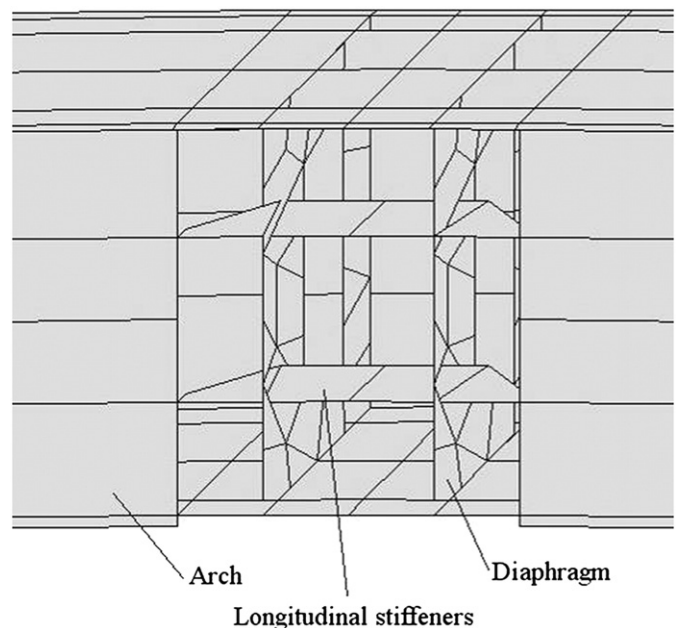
Detail of the stiffening of the arch cross-section at the connection with wind bracings in the finite element model of the Albert Canal Bridge.
